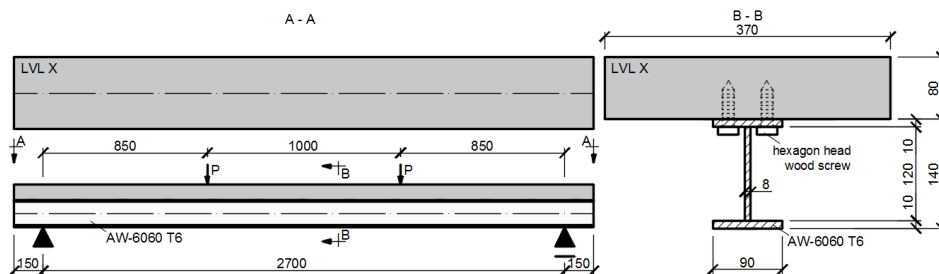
The analysed aluminium and timber composite beam: A-A - top view, B-B - cross-section
